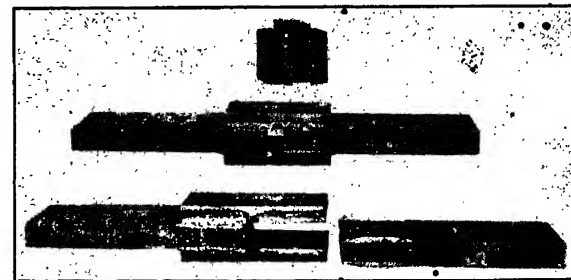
TESTS ON WELDED STRUCTURAL STEEL SHOWING COMPRESSION AND TENSION SPECIMENS AFTER FAILURE
